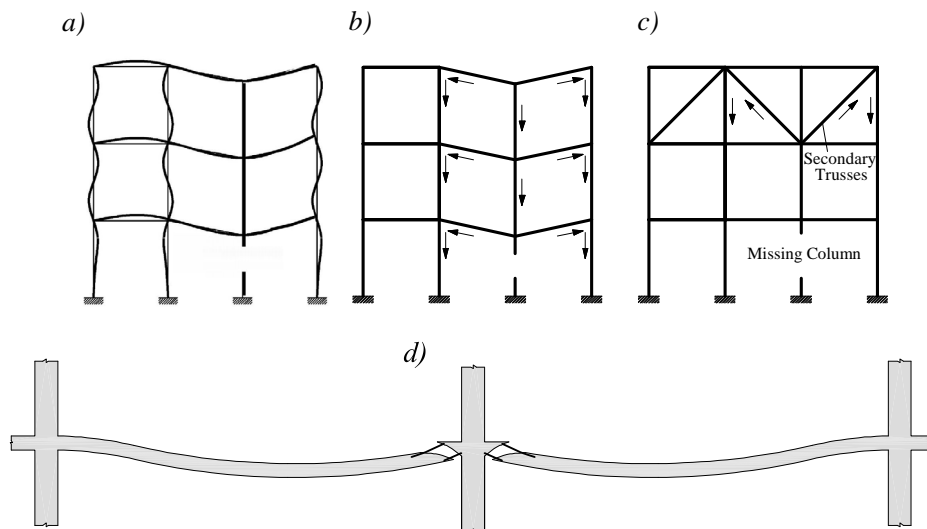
Post-failure load-carrying mechanisms in concrete structures: a) Vierendeel action, b) catenary action, c) secondary trusses, and d) membrane action in reinforced concrete slabs (Ellingwood et al., 2007)
